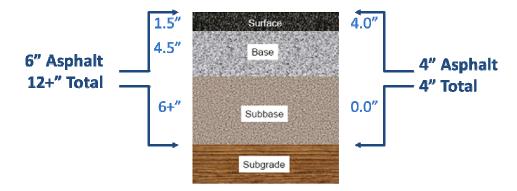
CORE SAMPLE RESULTS - PAVEMENT CROSS SECTIONS
